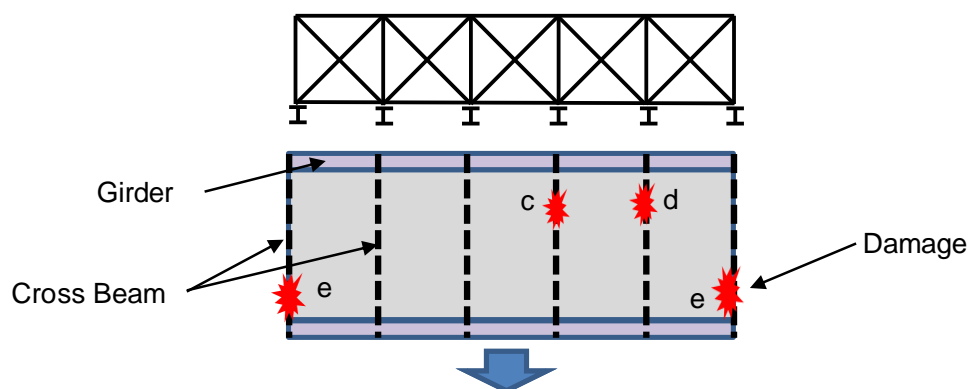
Damage (Rivet / HSFG) (Main Girder)
